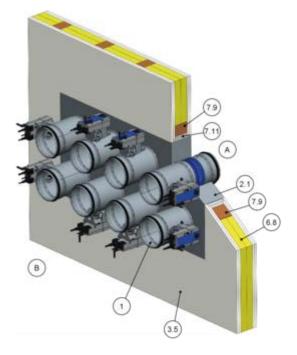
Mortar-based installation in lightweight partition wall with timber stud – Multiple occupancy of an installation opening
